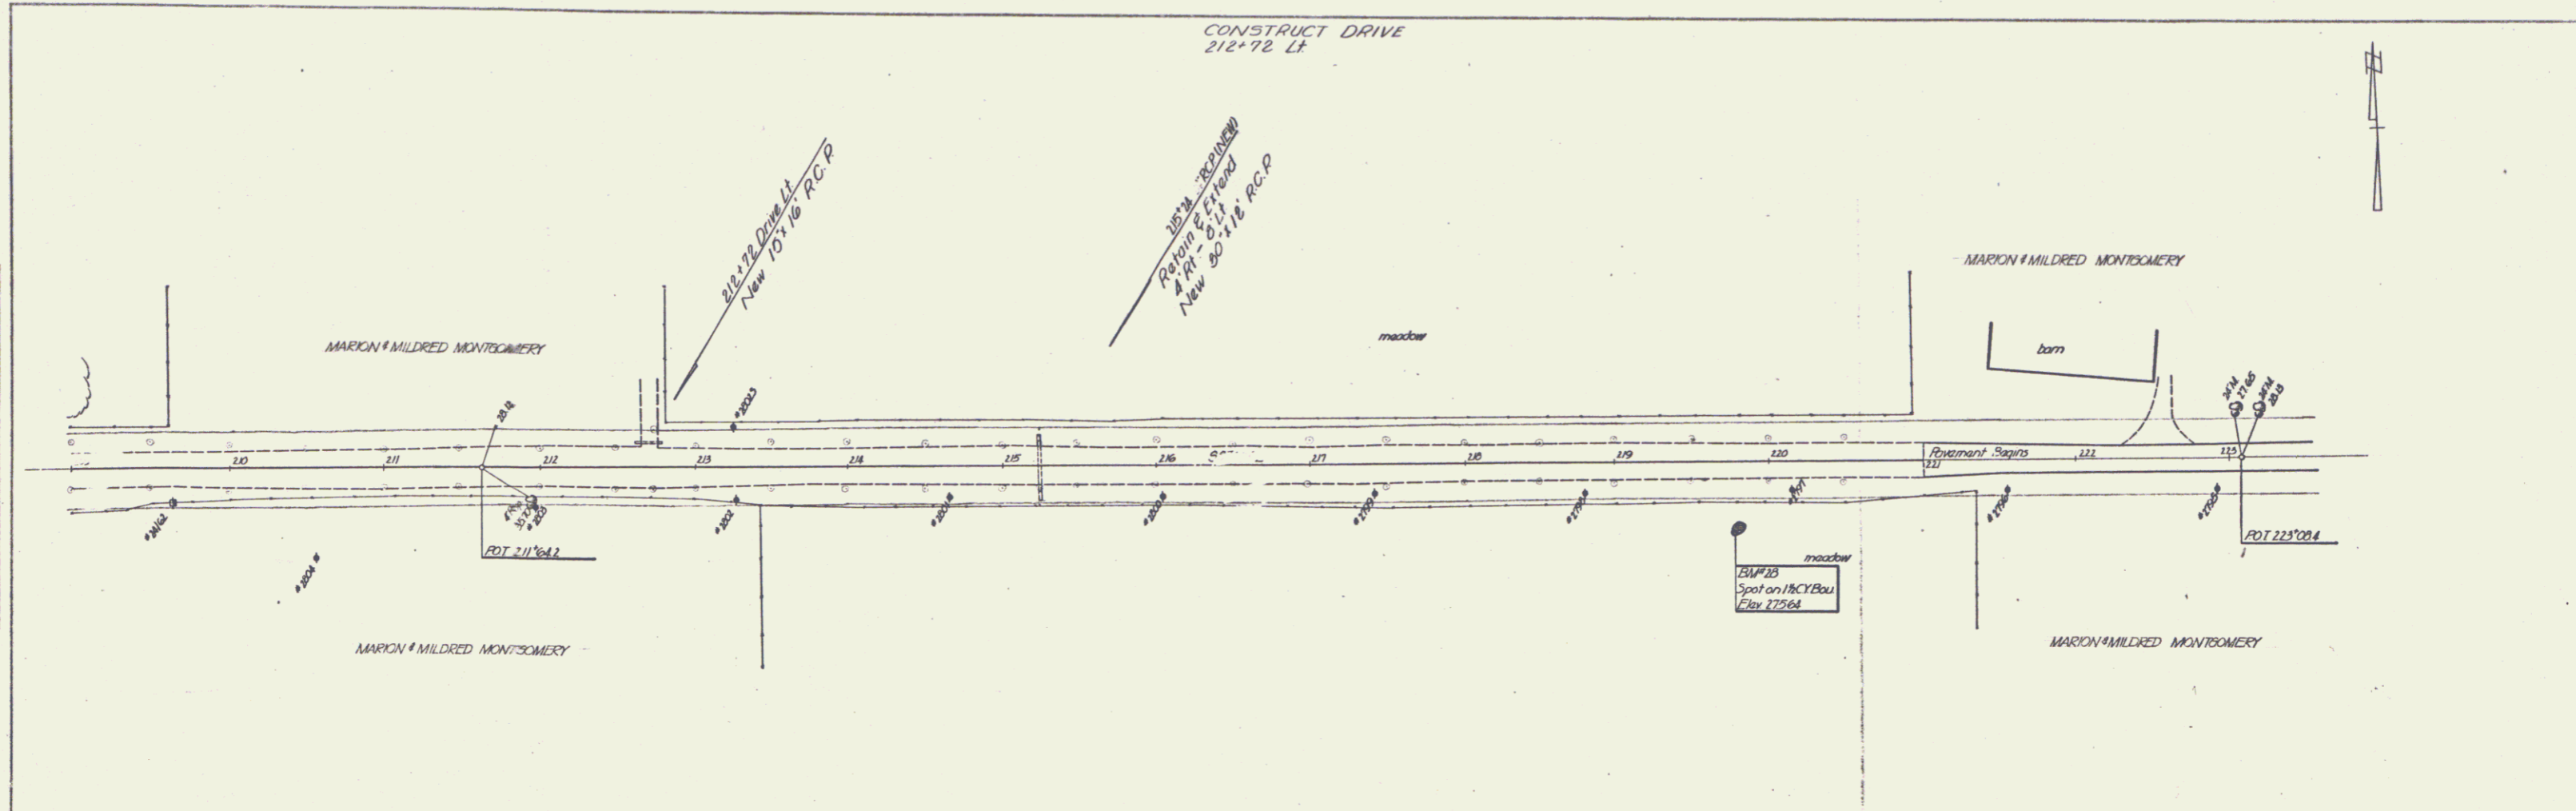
PLAN PROFILE D. P. & R. E. STINARD
